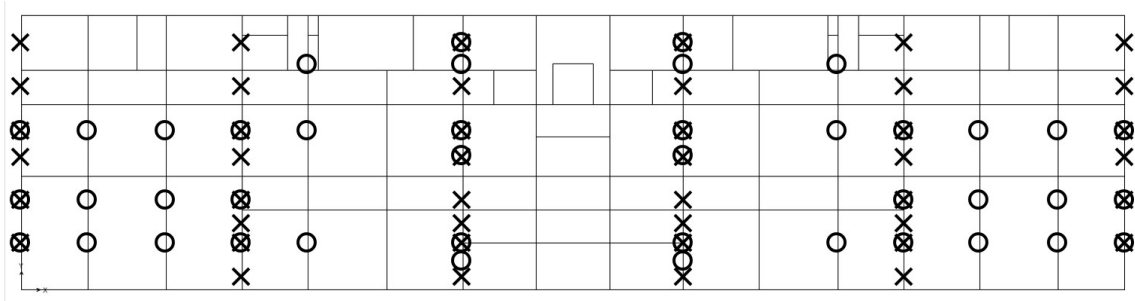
Damper Placement at 3rd floor (R-Y); MSSSA: 44 dampers;
